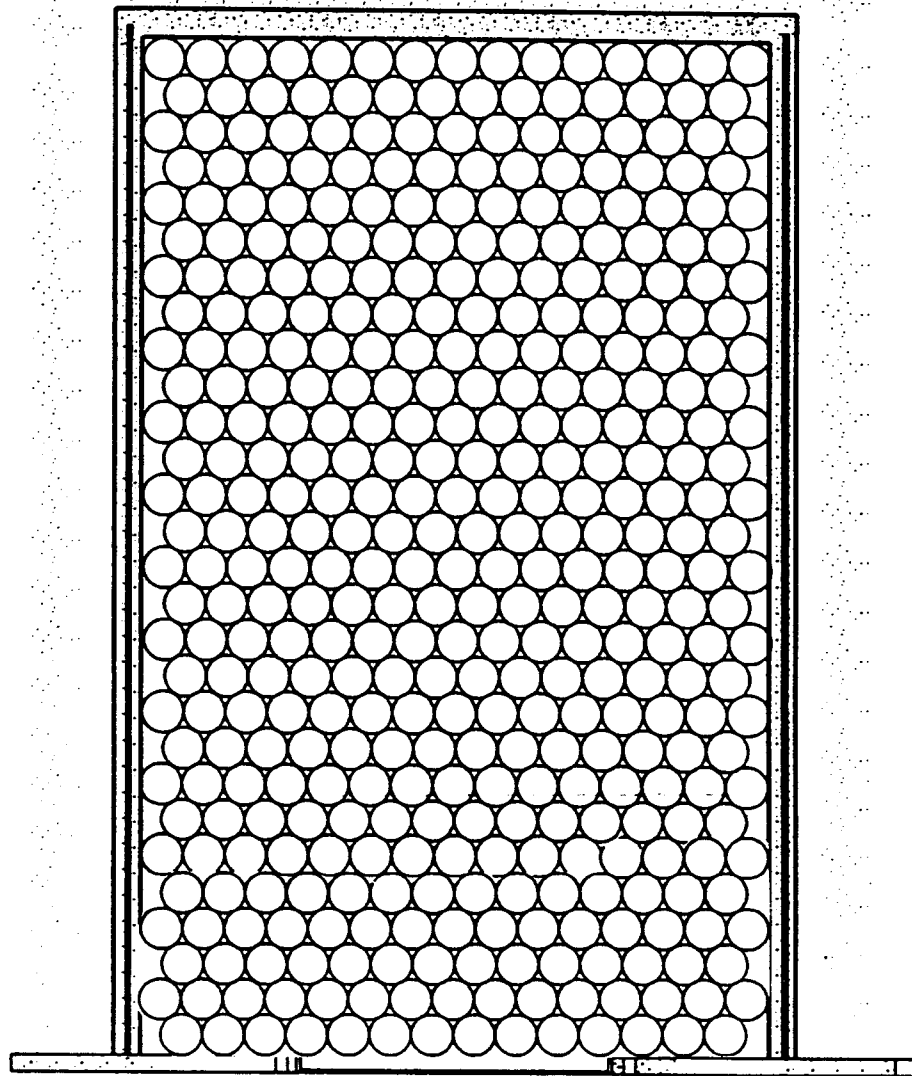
Steel Arch Construction Magazine Proposed Horizontal Palletized Multiple Stacking Configuration
